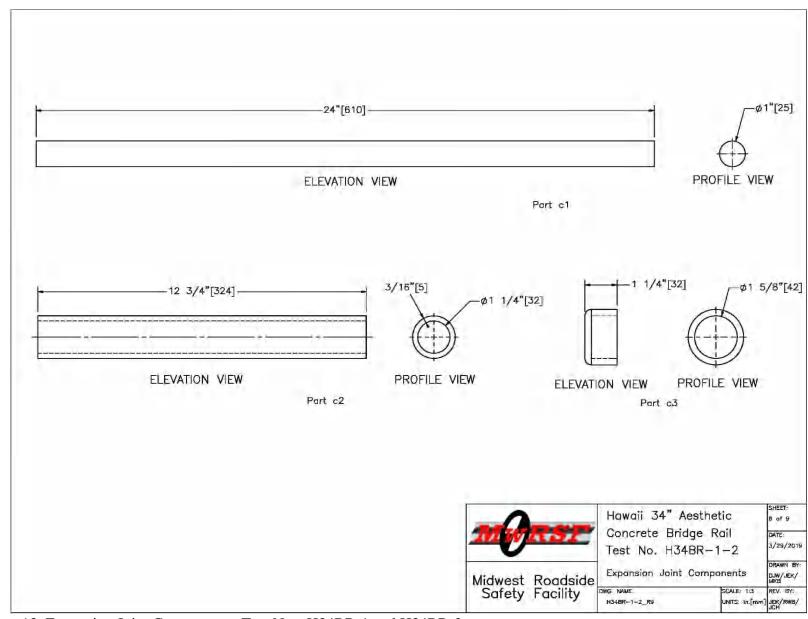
Expansion Joint Components, Test Nos. H34BR-1 and H34BR-2
